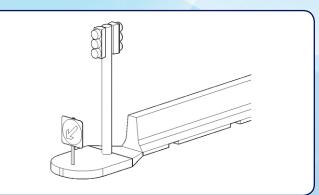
At a road junction, if the risk of vehicles veering off the carriageway is low, the concrete barrier can be placed behind the kerbed median and traffic signal.
